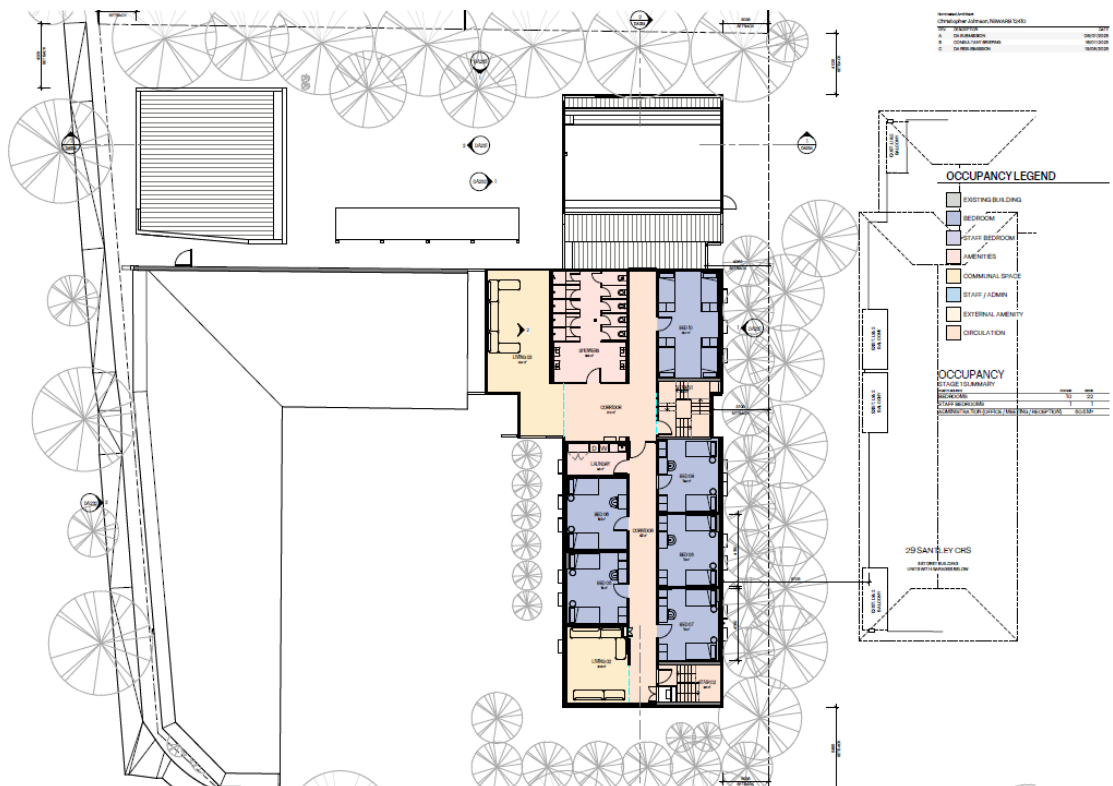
Stage 1 - First floor layout plan (Source: PTID)
